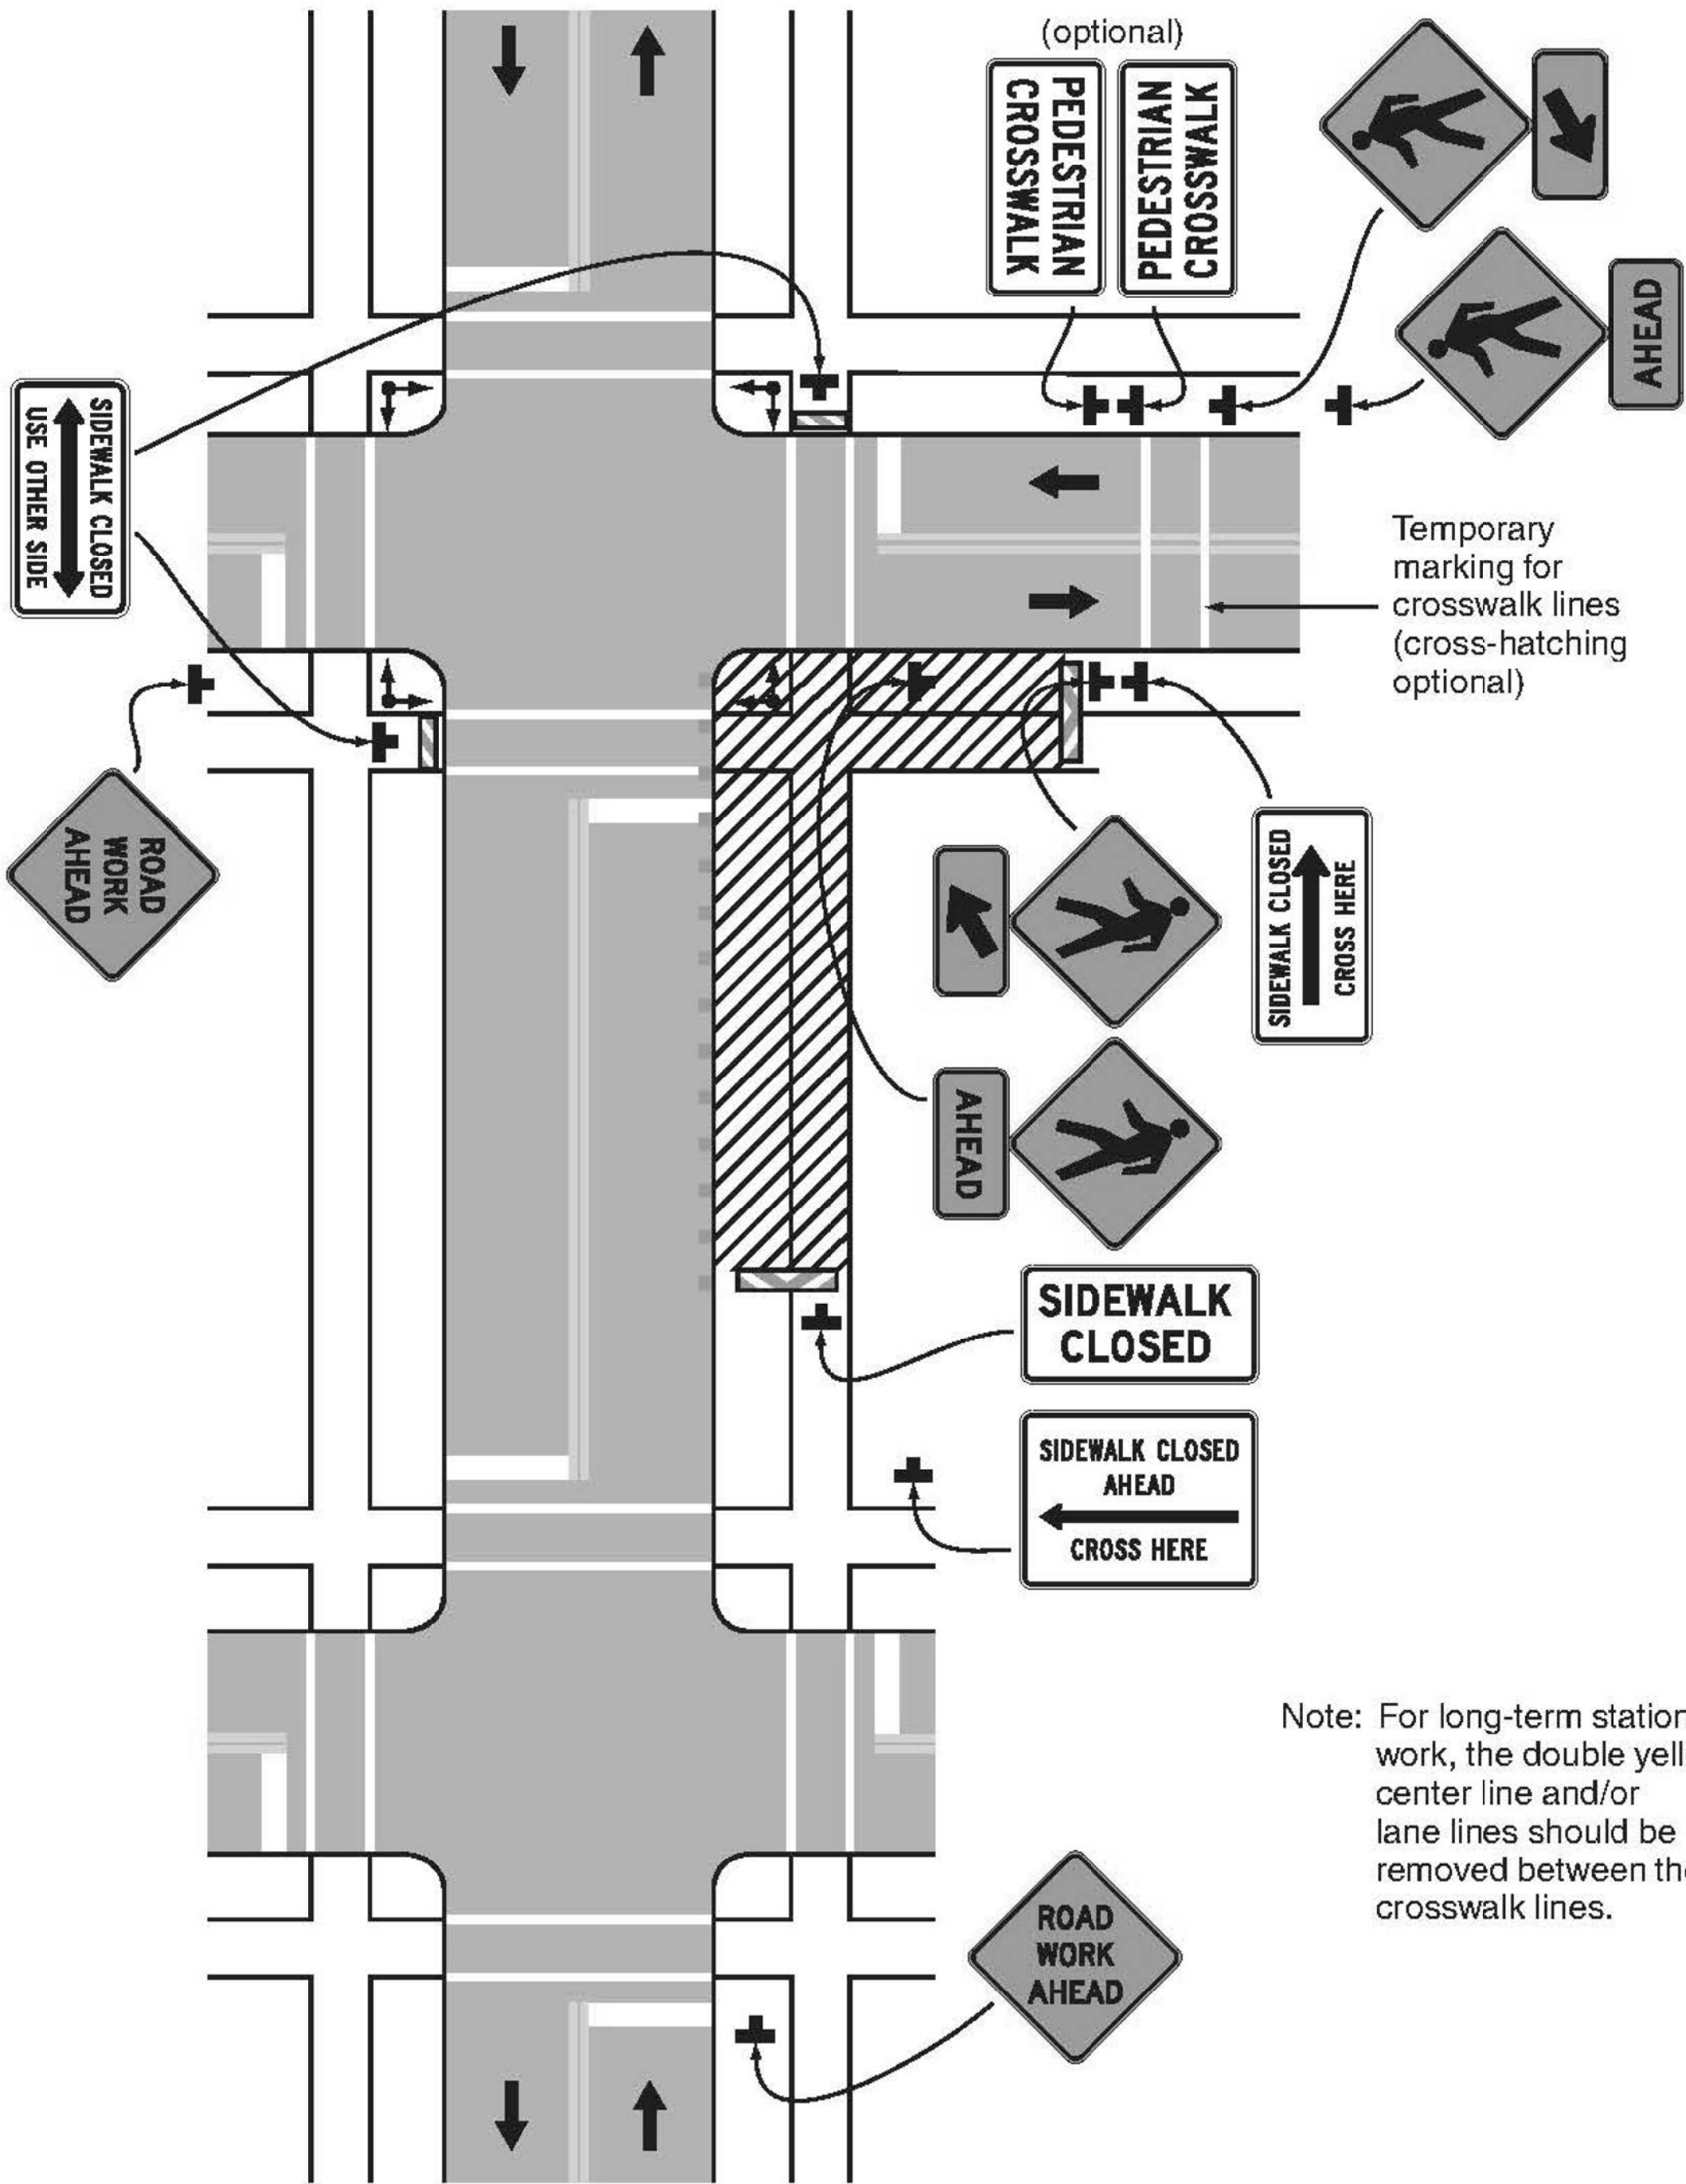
H-28. Sidewalk Detour or Diversion (TA-28)
